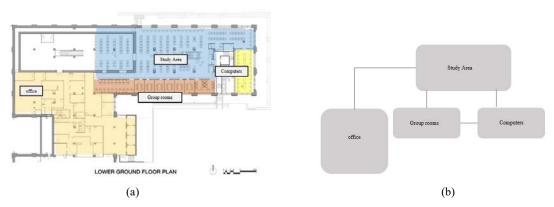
Raheen Library of Australia (a) sub-floor plan, and (b) spatial diagram of sub-floor spaces
